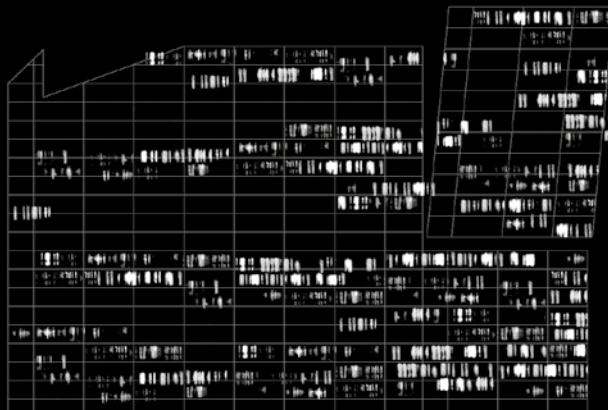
DETAILED LAYOUT OF MASKS ON THE FAÇADES
